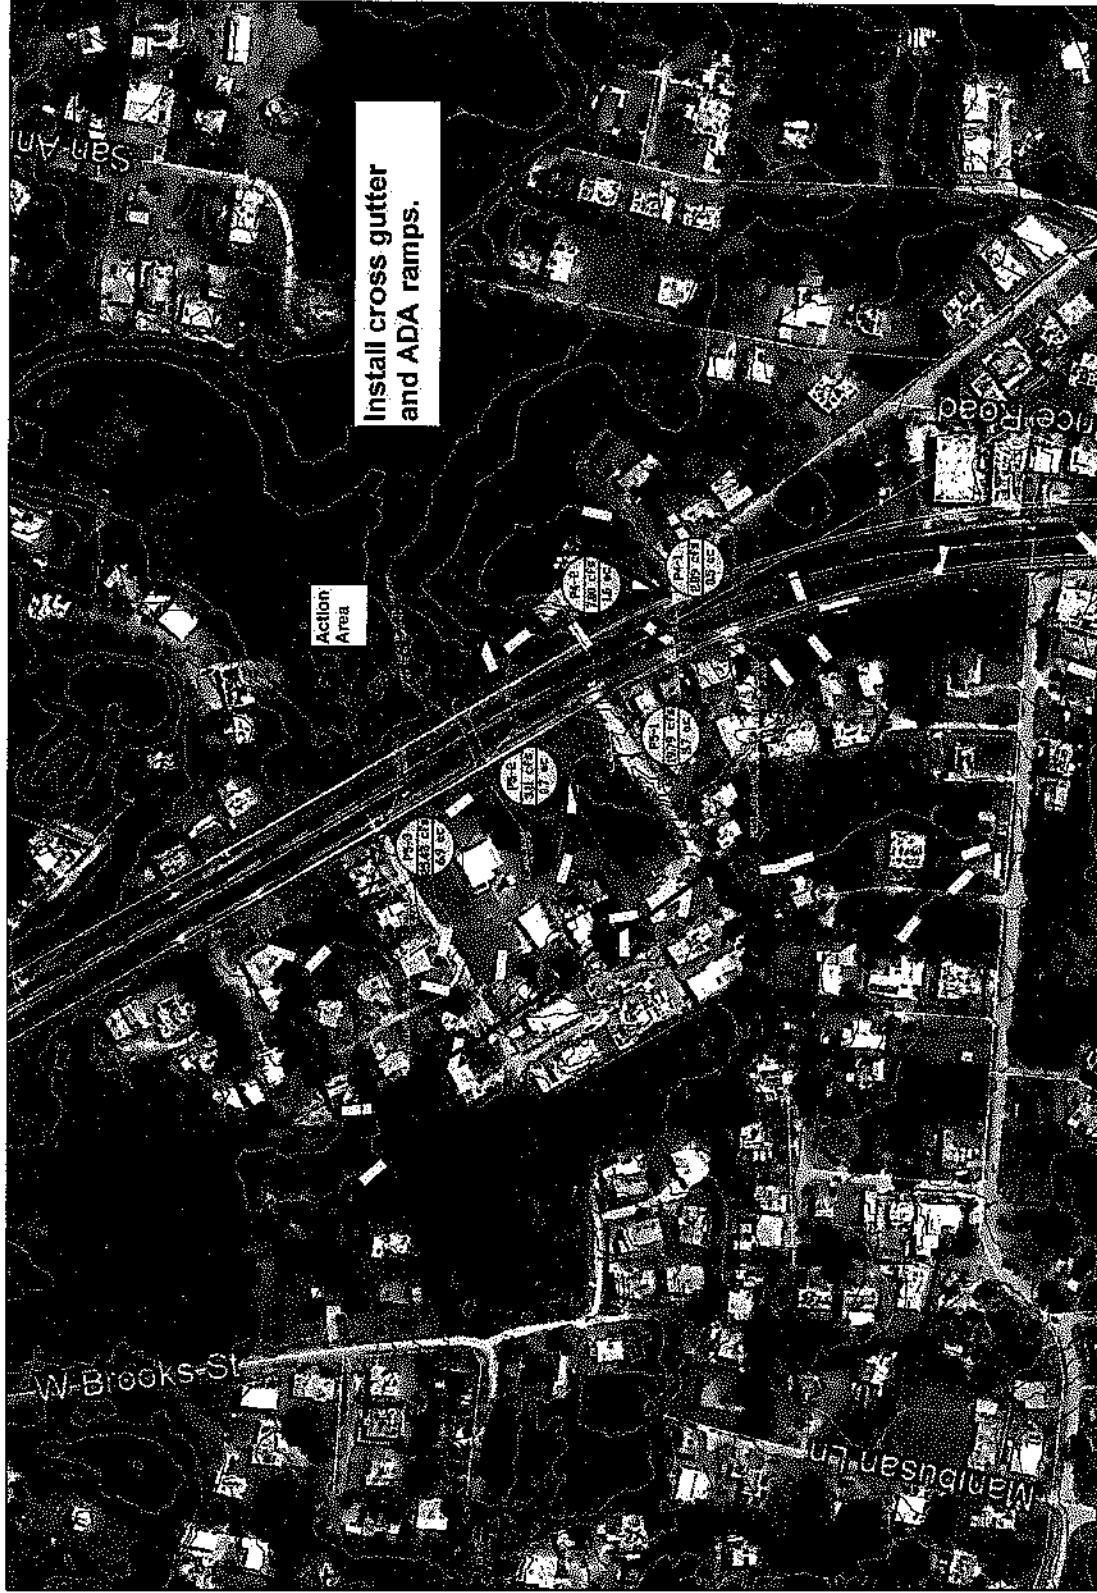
ROBERTO STREET PEDESTRIAN CROSSING PLAN
